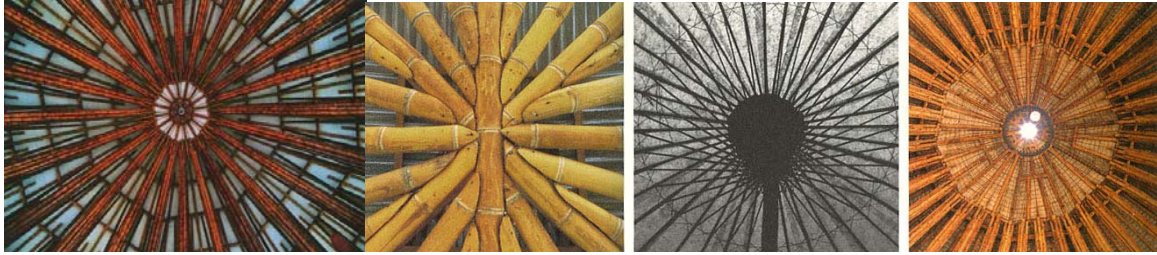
Conventional Roof Joints (Oprins, 104 and Kries, 208)
